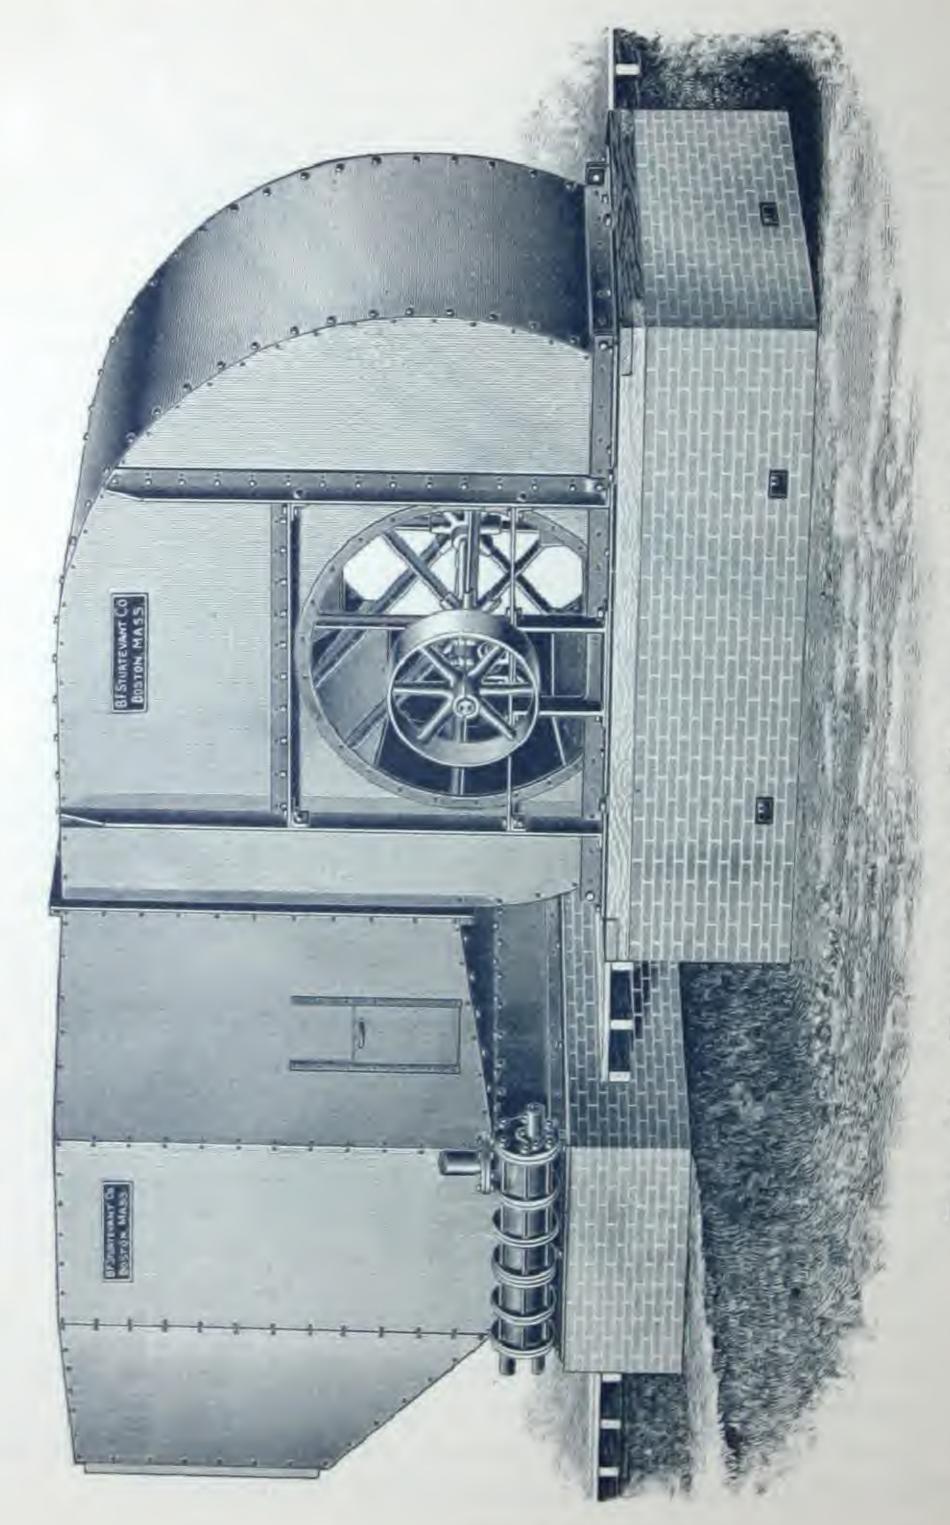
HEATING AND VENTILATING APPARATUS, ARRANGED TO BLOW THROUGH, WITH THREE-QUARTER HOUSING PULLEY FAN.
